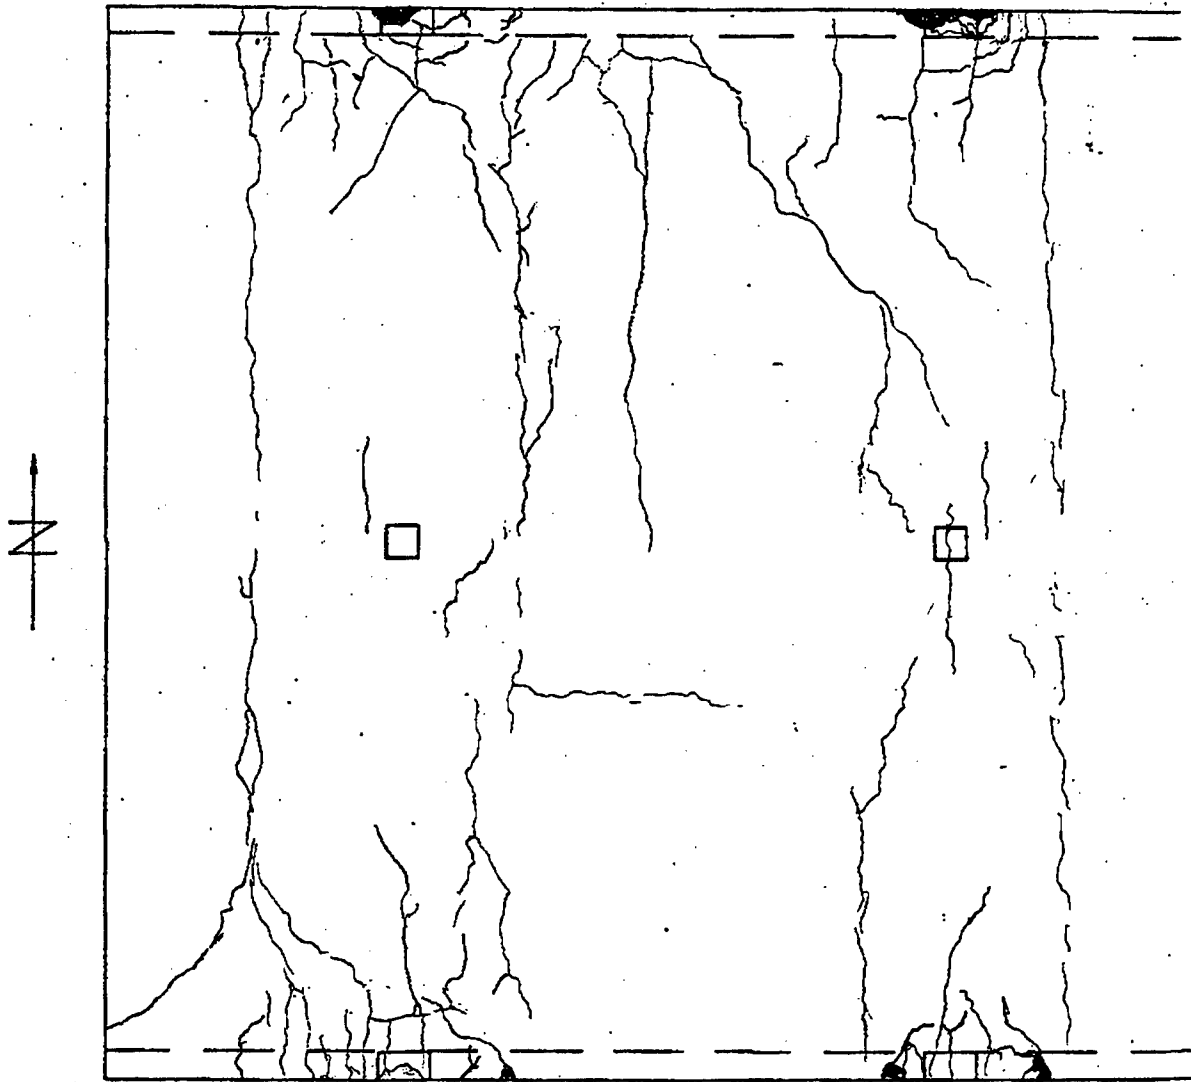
Crack Pattern, Third Floor Slab, Top Side, Post-E200N
